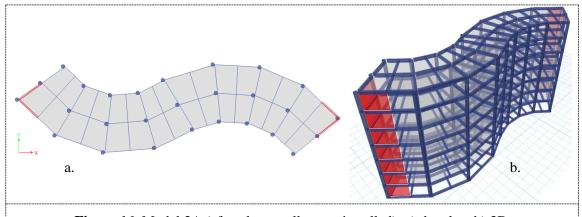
Model 3A (after shear walls were installed): a) the plan, b) 3D.
